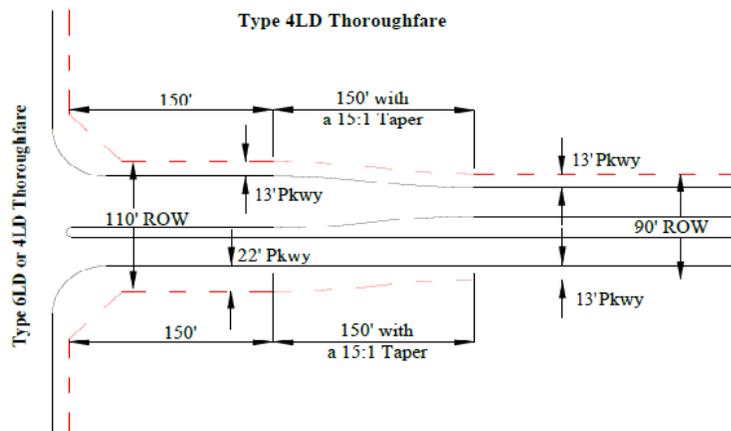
Type 4LD Thoroughfare Intersection Detail
